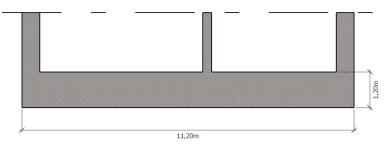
Dimensions floor - rail crossing section (SketchUp)
